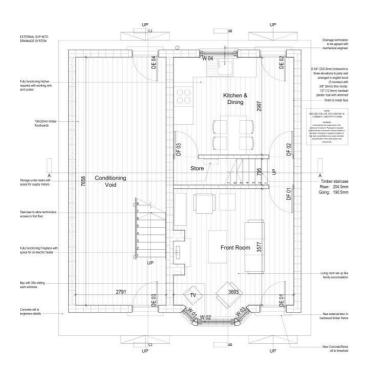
Ground Floor Plans of Salford Energy House and Conditioning Void
